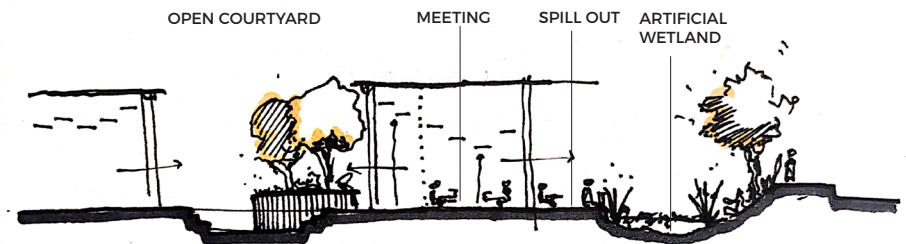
GROUND FLOOR CONCEPTUAL SECTION (AUTHOR 2021)
